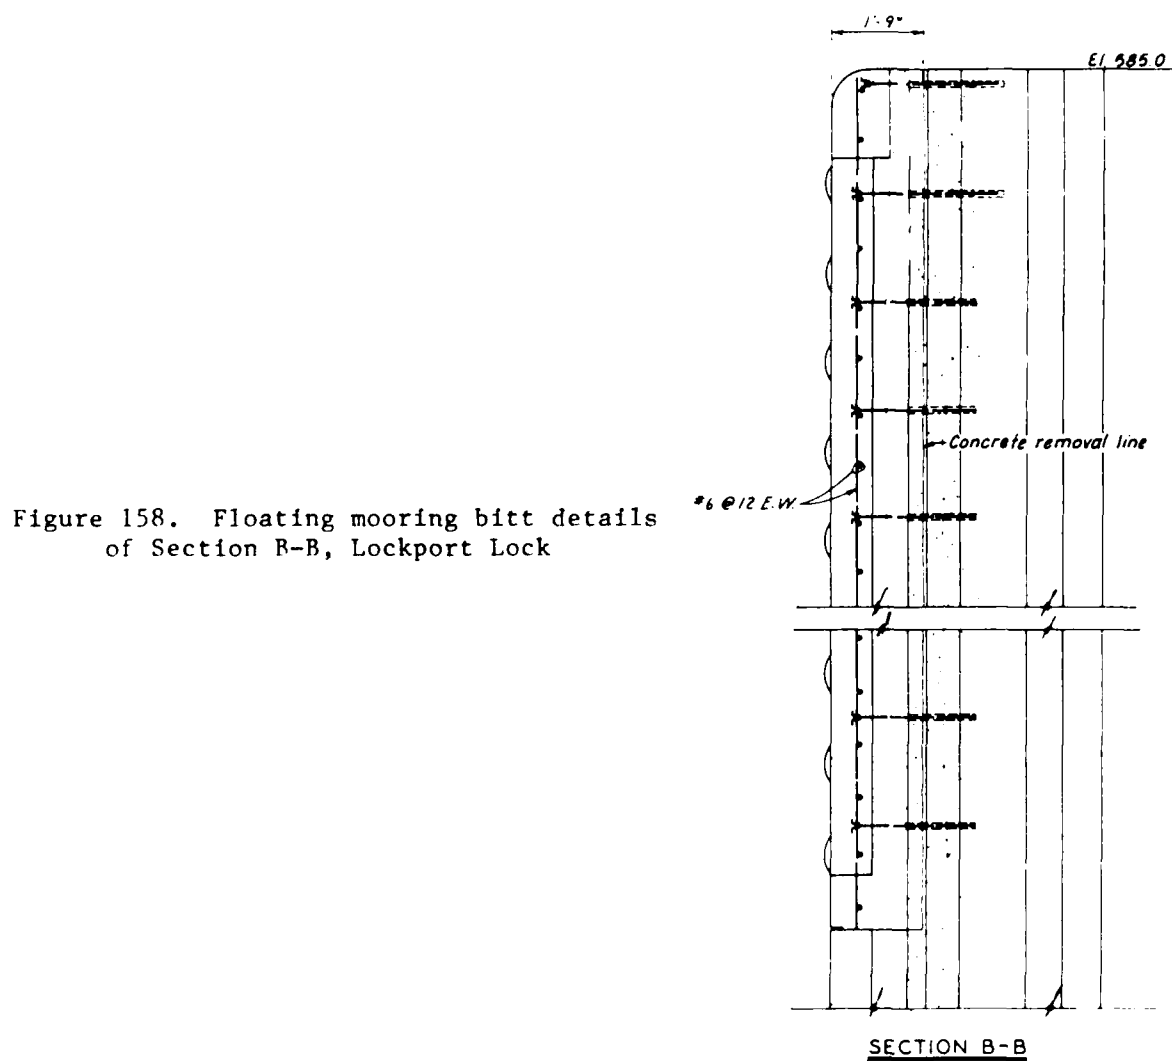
Floating mooring bitt details of Section B-B, Lockport Lock
